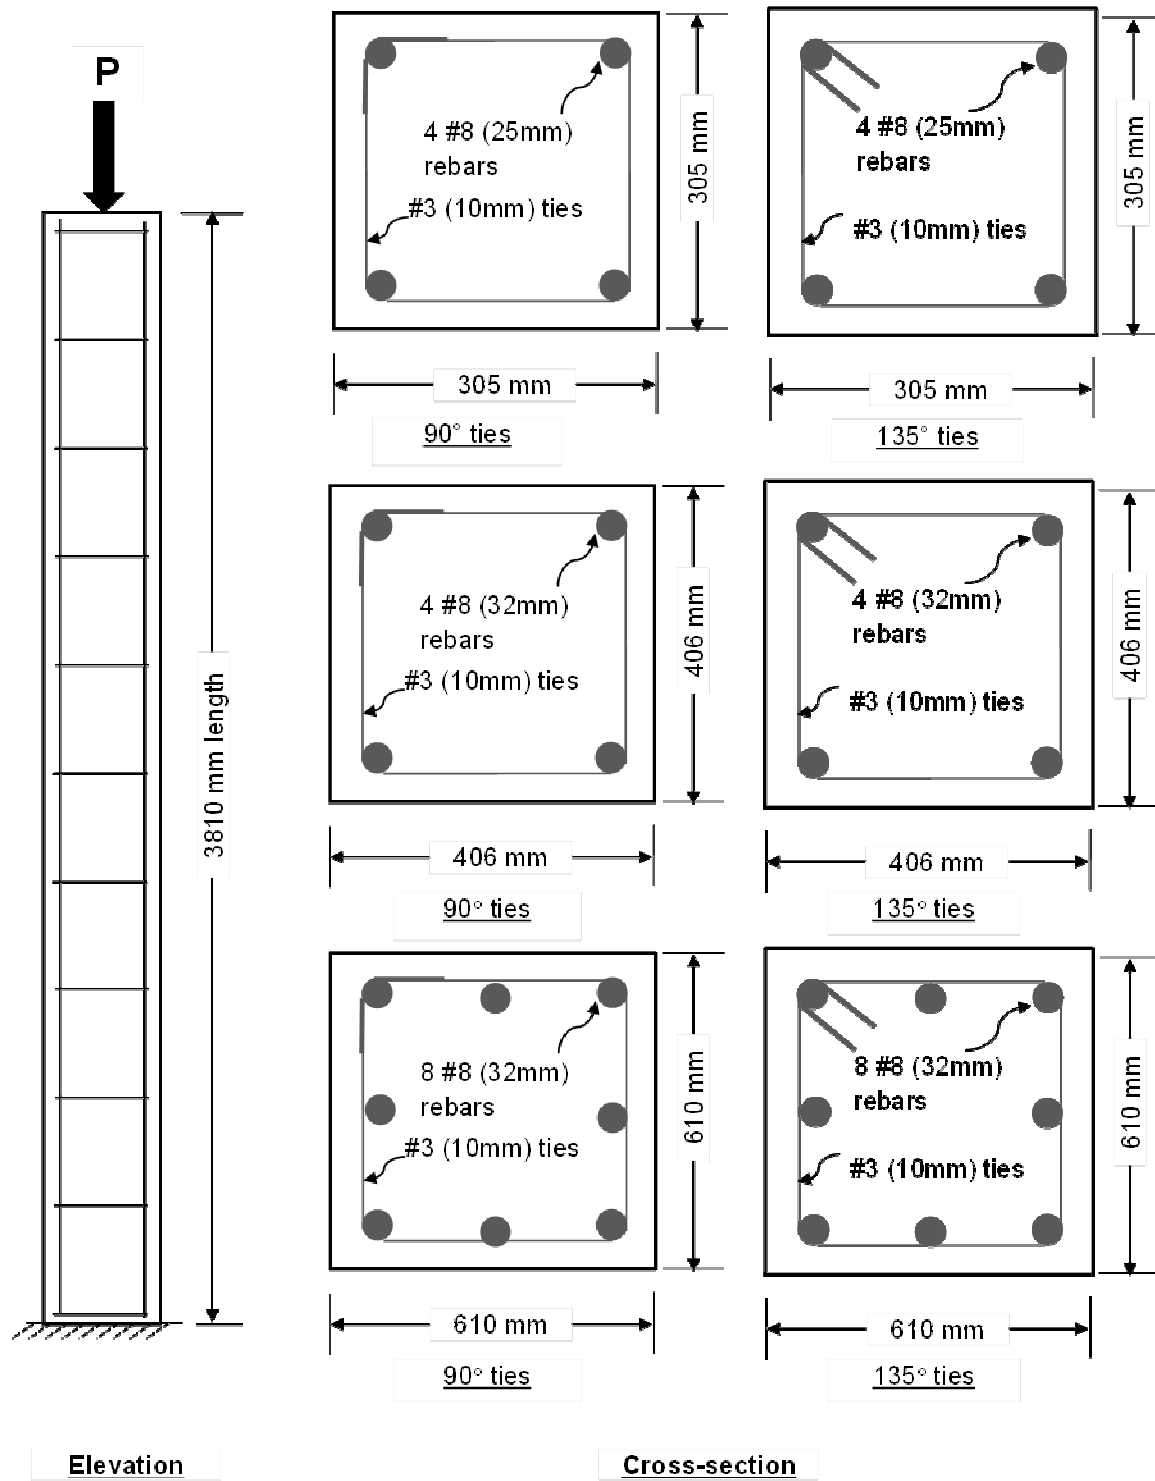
Elevation and cross-sections of RC columns used in parametric study
